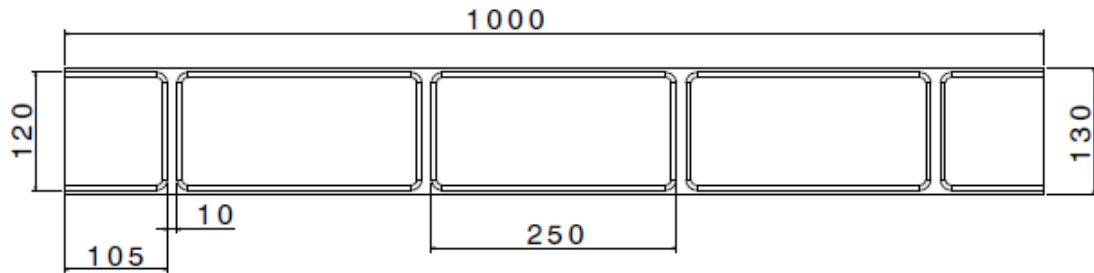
Demonstrator design dimensions (all dimensions in mm)
